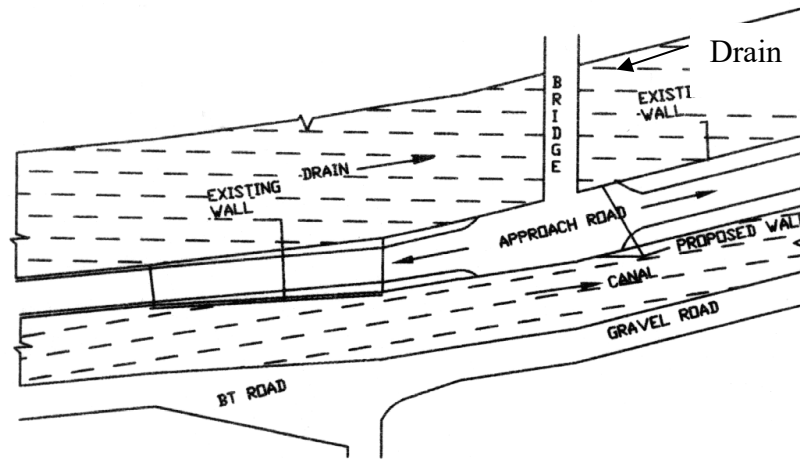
Site plan of foot bridge approach at Bhimavaram – Losari Road
